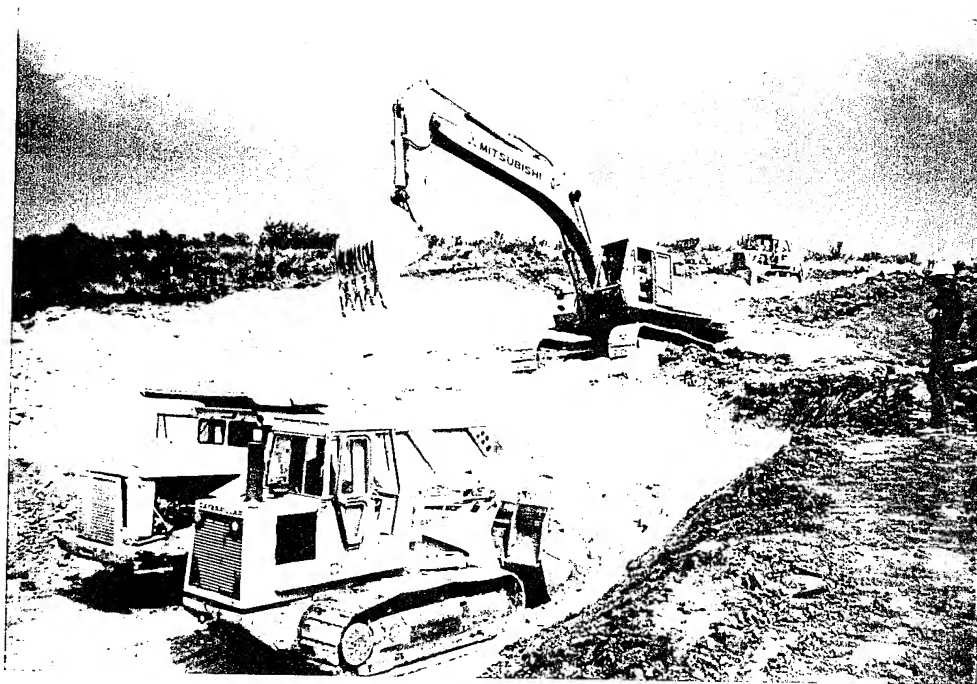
(Equipment 1). Dozer, track hoe, front end loader and dump truck excavating at the upper right abutment during the core trench contract.
